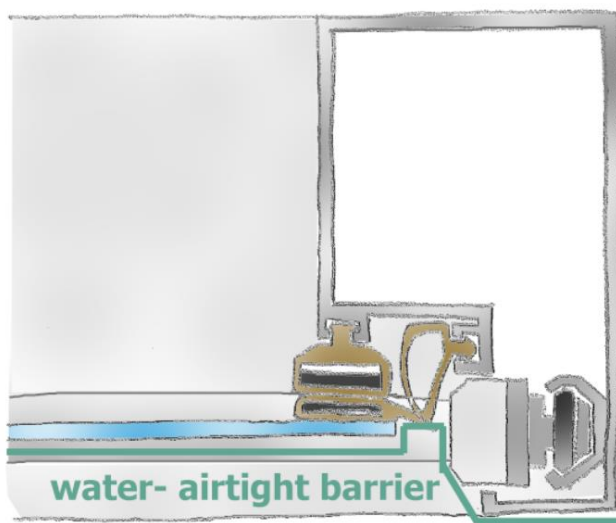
Conceptual sketch of the horizontal section detail of option 1
